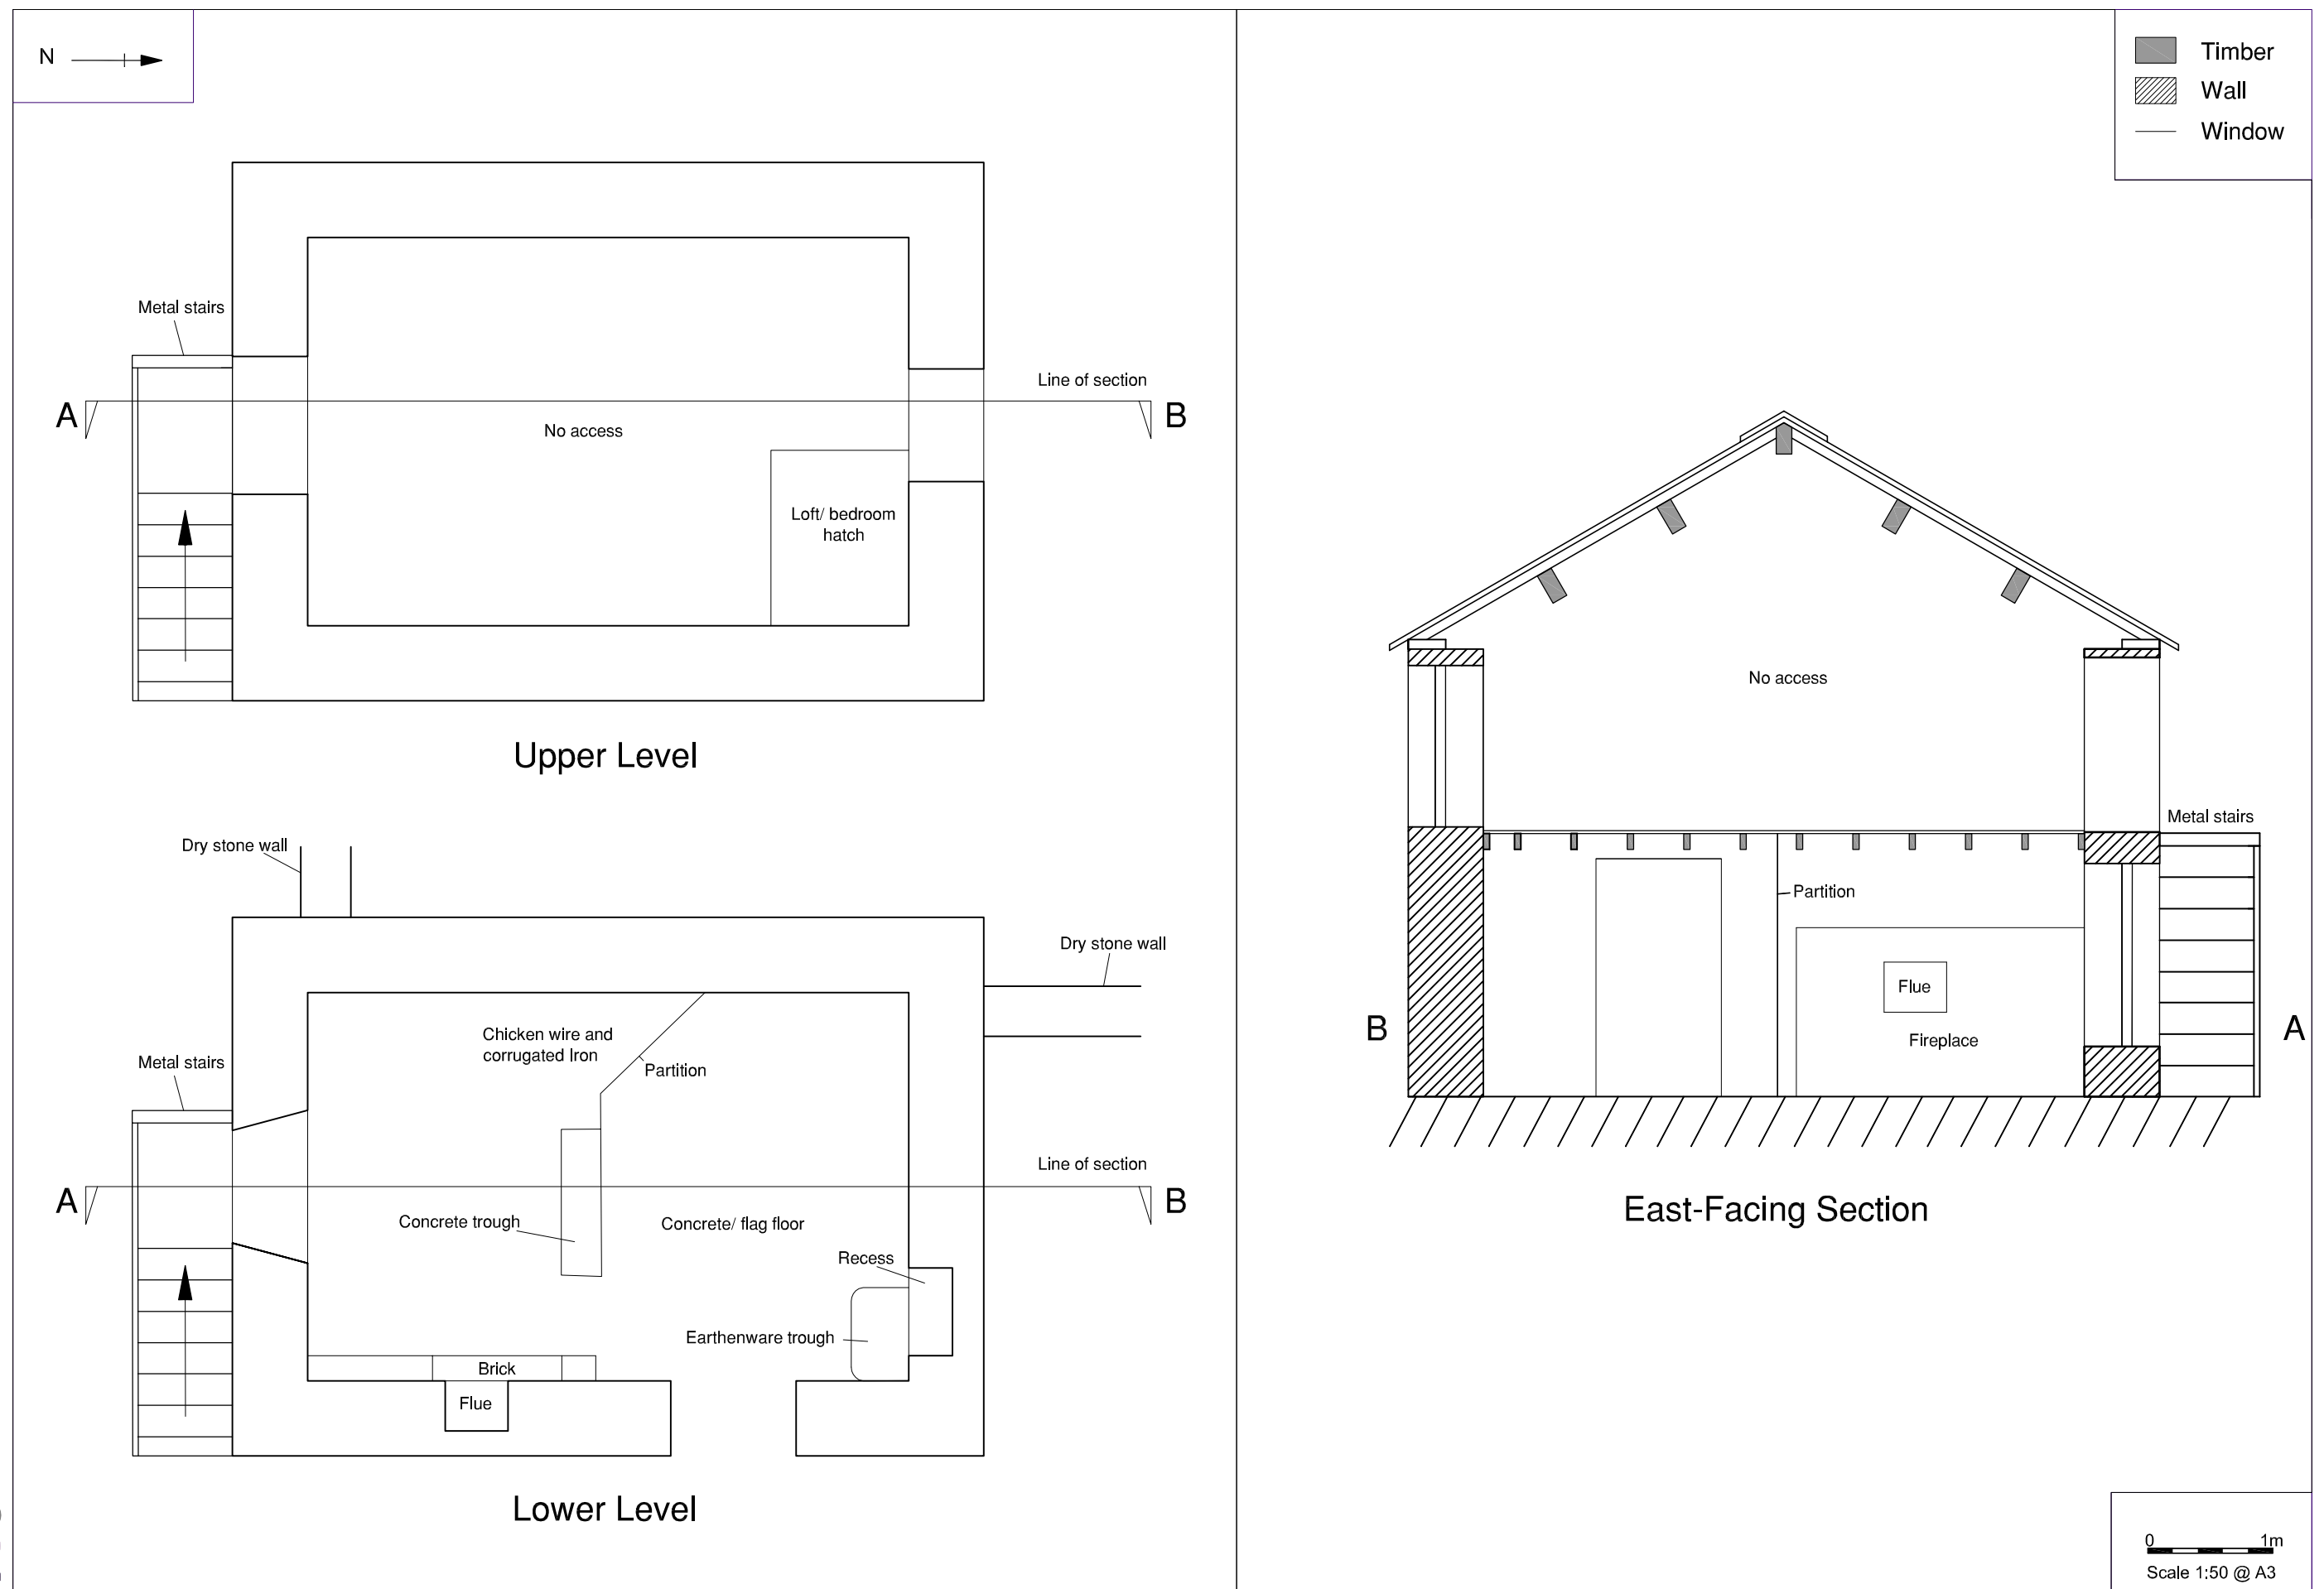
Plan of Ground Floor, Upper Floor and East - Facing Cross - Section of Cottage
